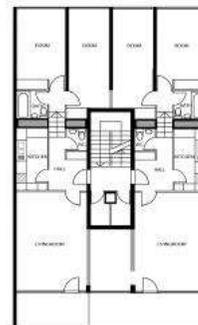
House openings on the walls (Schneider & Till, 2007, p. 84)
